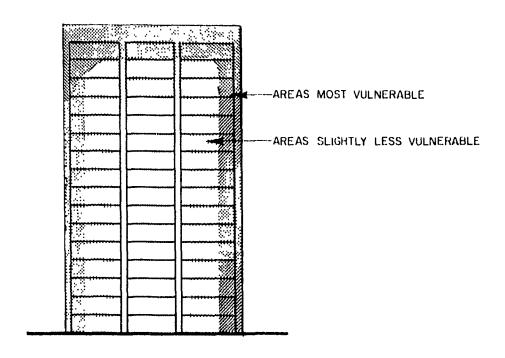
Typical wetting pattern on the face of a multi-storey building subjected to wind-driven rain [37]
